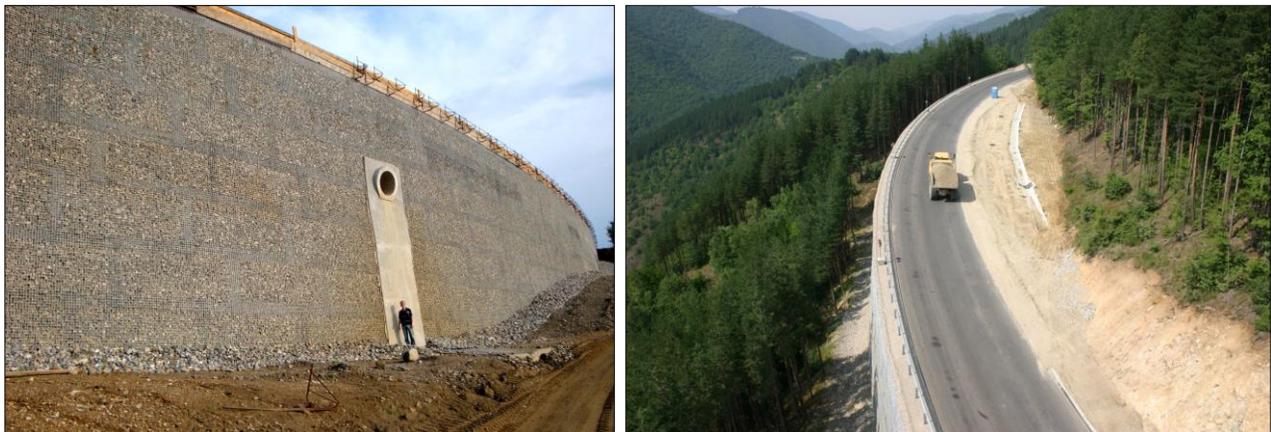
Front view of a GRS-wall before reaching the final height but with partially installed Muralex^R facing and completed culvert (left), top view of a completed wall (right).
